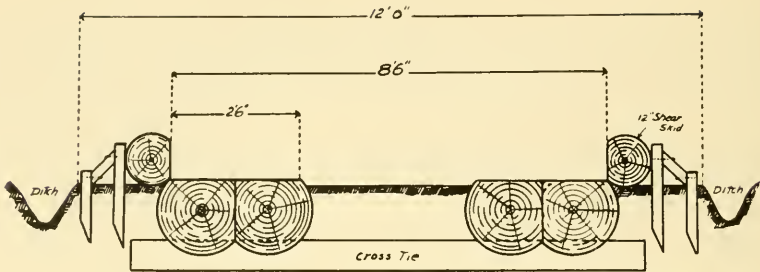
Cross section of pole road. Scale—1 inch equals 2 feet.
